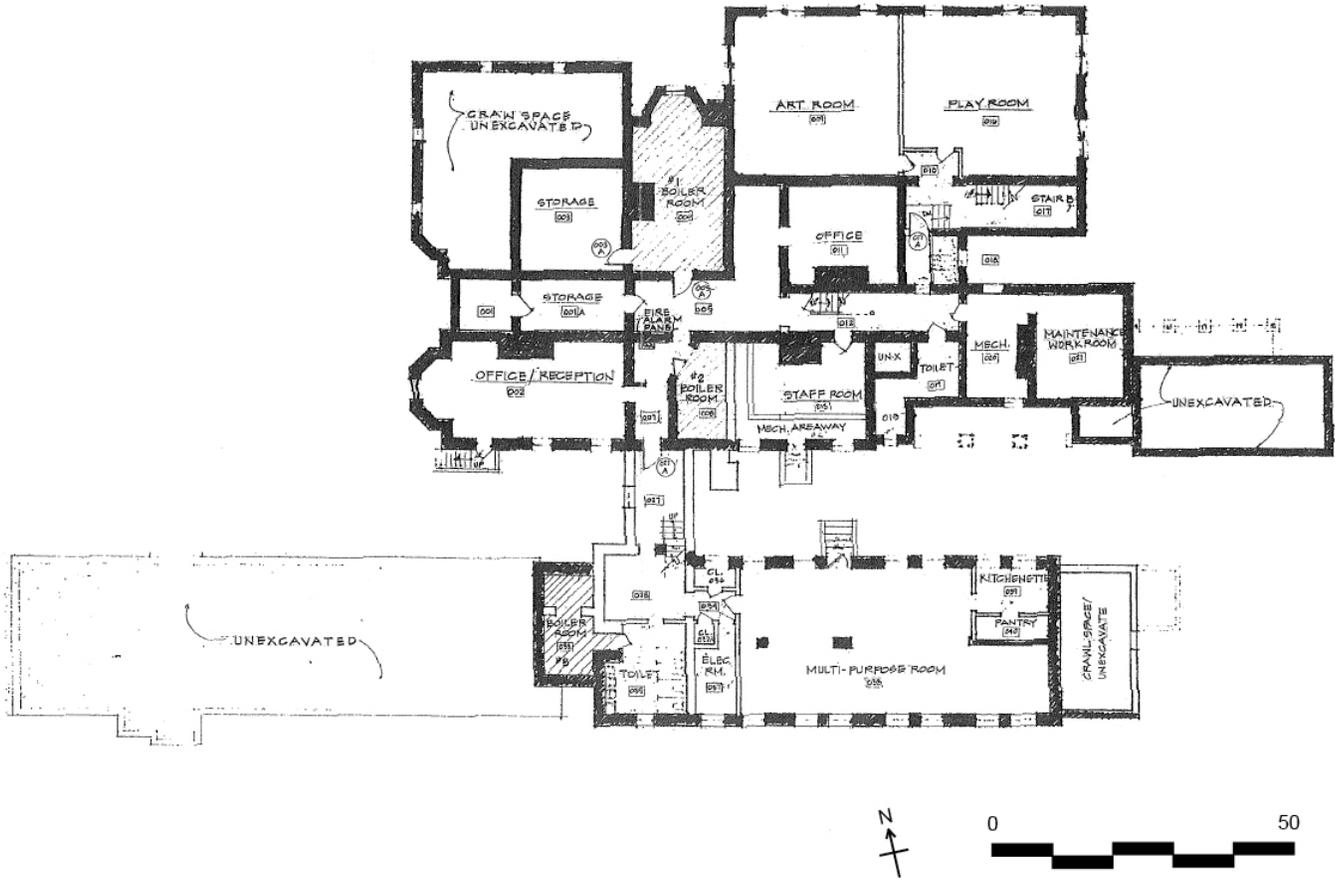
Figure D. Classroom Complex—Existing Conditions—Basement Plan
